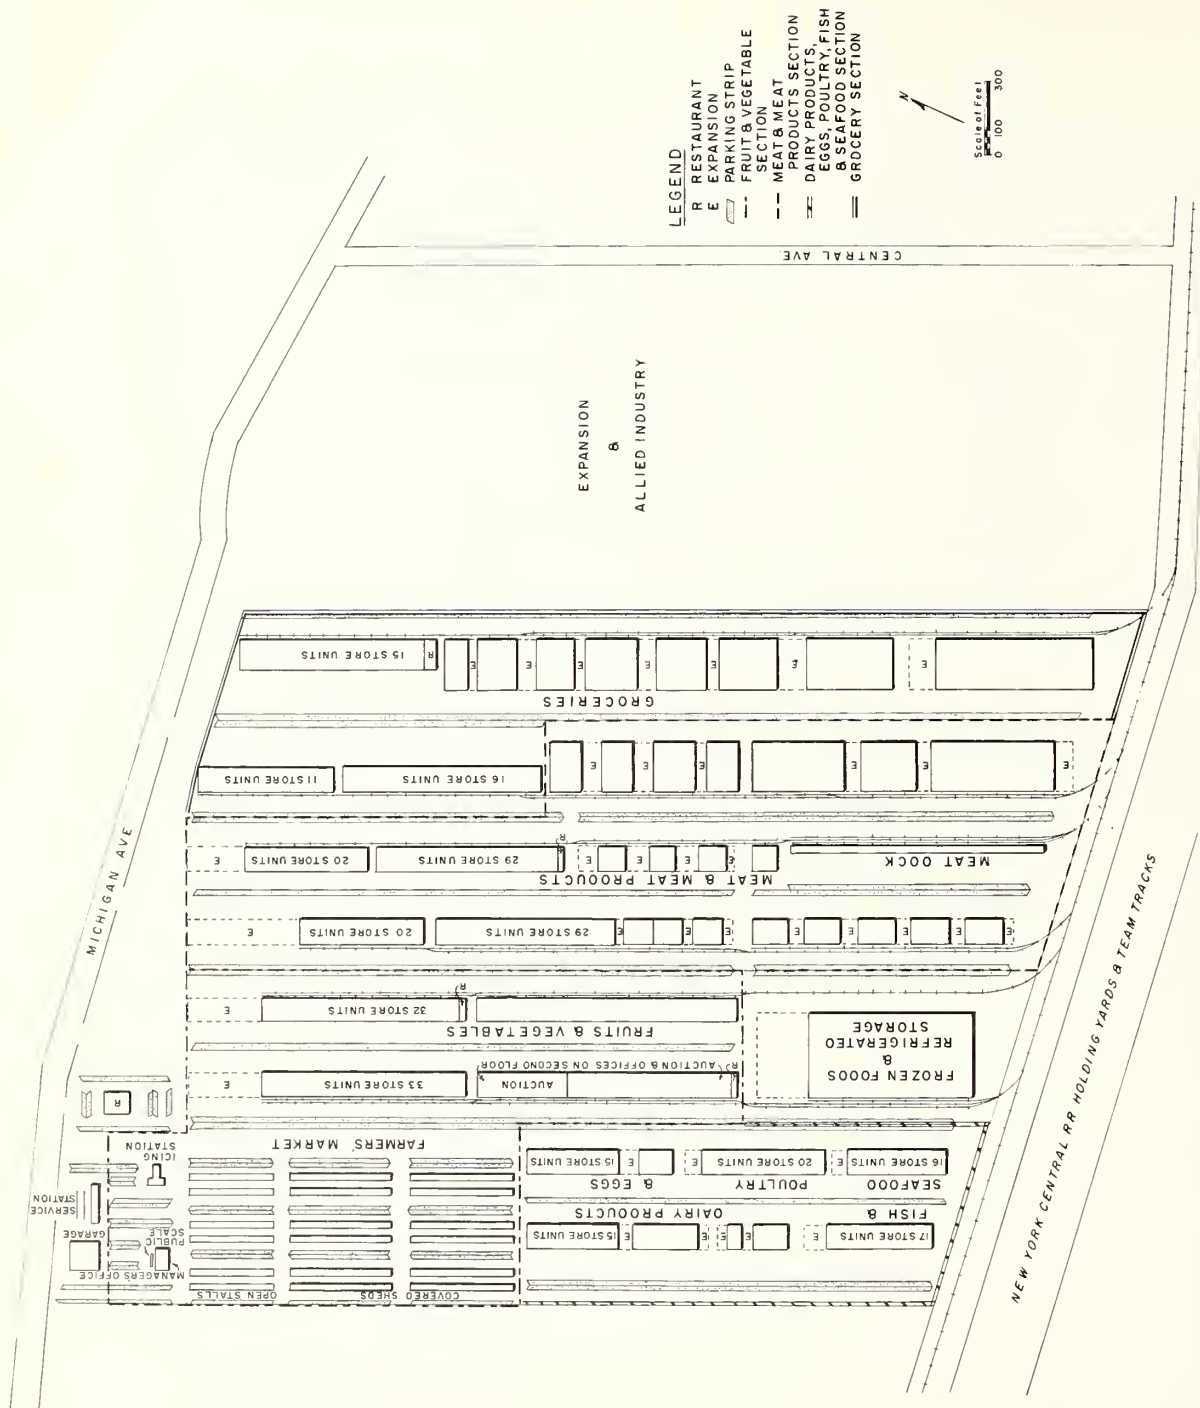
A layout of facilities for a wholesale food-distribution center located on the Central Avenue site.
